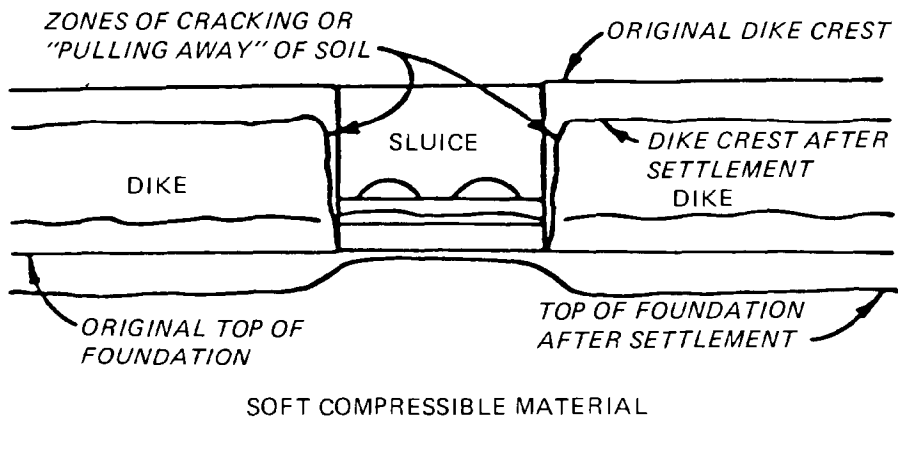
Cracking at dike-structure junction caused by differential settlement because dike load is much greater than weir load
